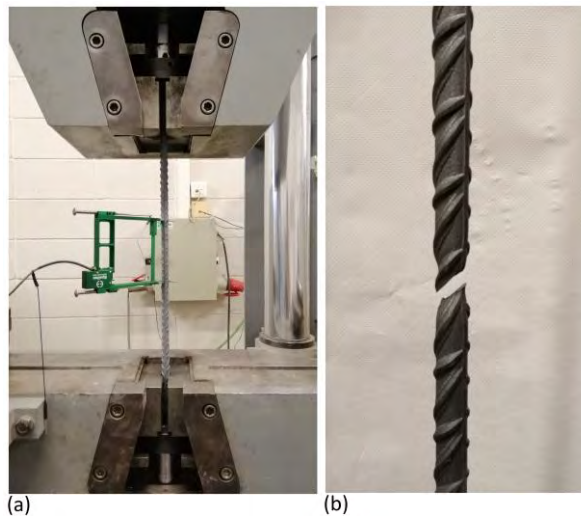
Tension test on steel reinforcing bar: (a) Test setup and (b) Failure mode.
